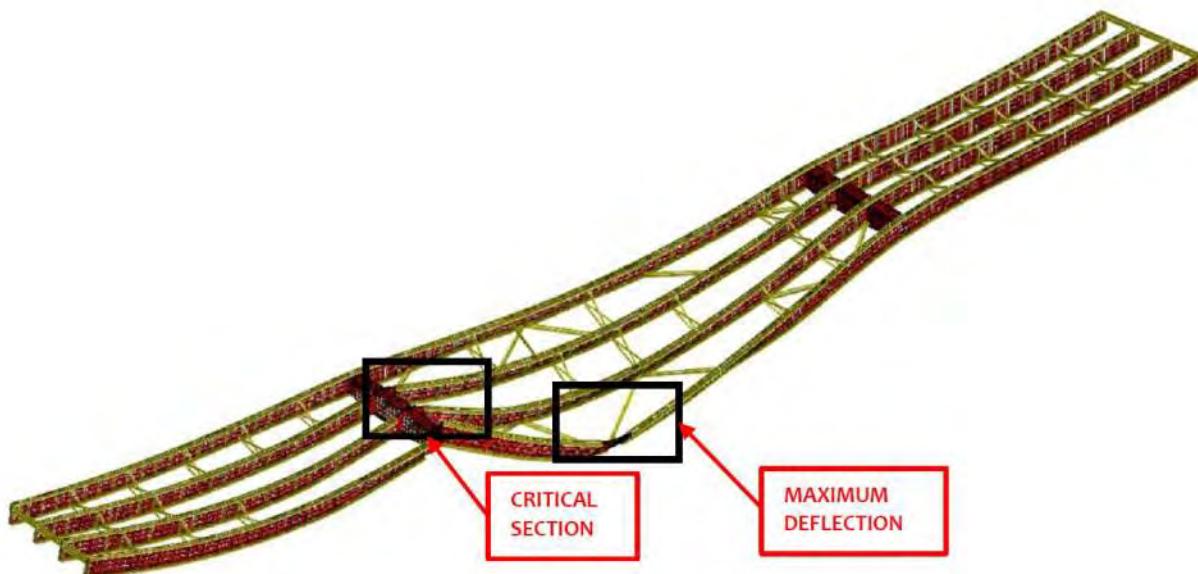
Structure framing plan with deformed shape (Deck not shown for clarity)
